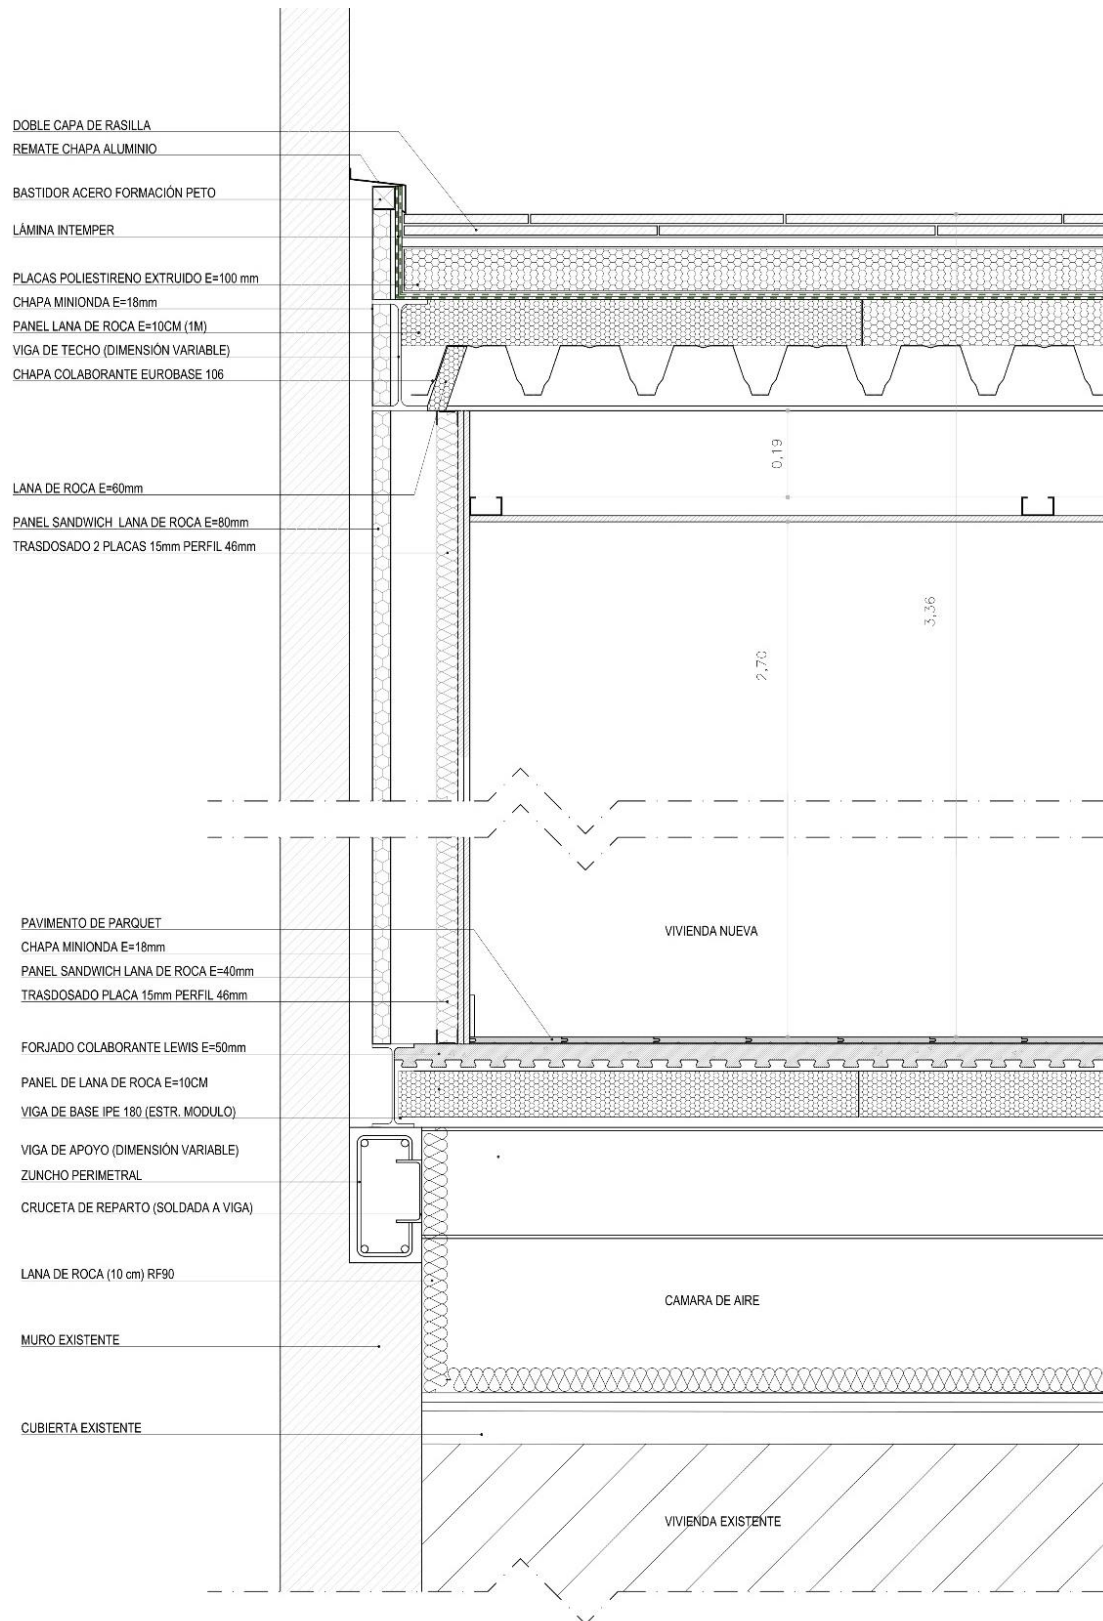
Detailed cross-section of the connection between the existent building and the added module at Letamendi 29.
